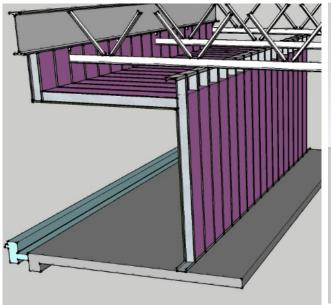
View of Temporary Weather Wall Under Construction Photo Courtesy of Balfour Beatty Construction
